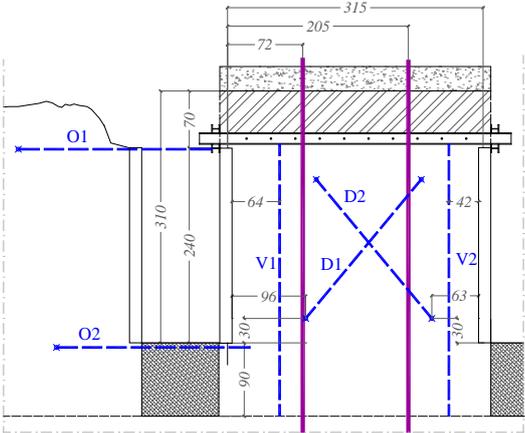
Draft of the transducers location on the masonry tested panel.
